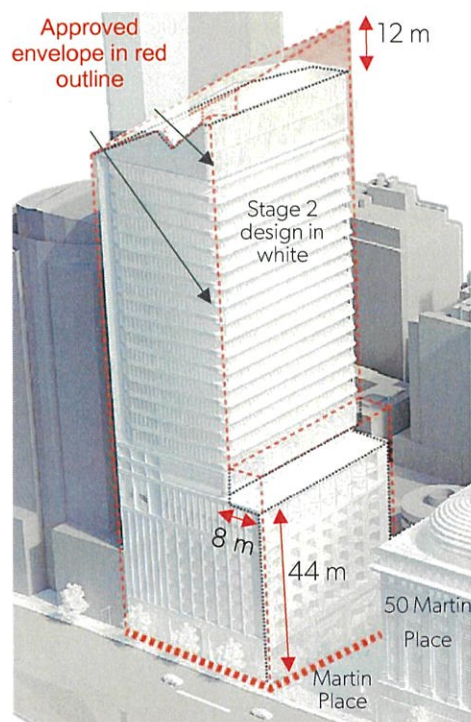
| 3D modelling of proposal fitting within the approved building envelope (Source: Applicant's RtS)
